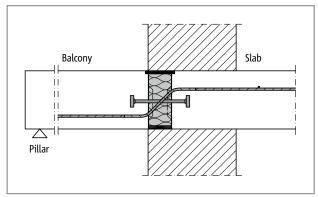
Schöck Isokorb® T type Q-P: Connection of supported balcony with thermal insulating cavity wall
